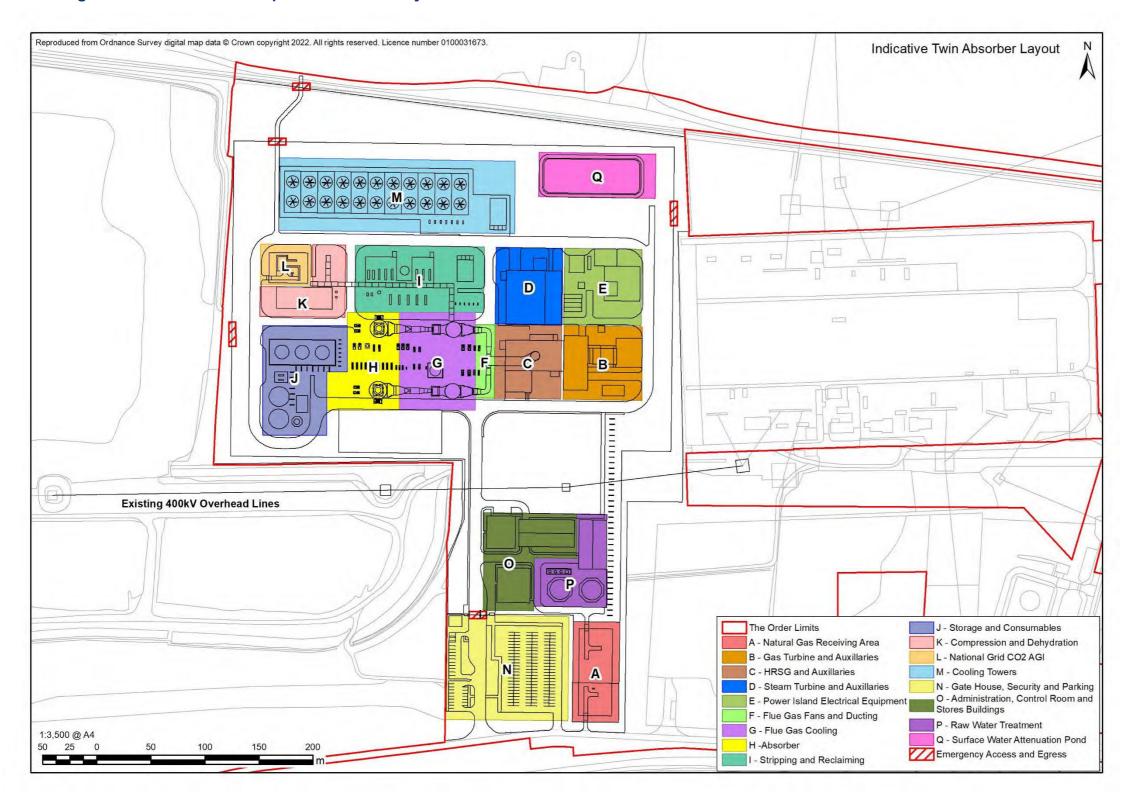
Indicative Proposed PCC Site Layout Twin Absorber
